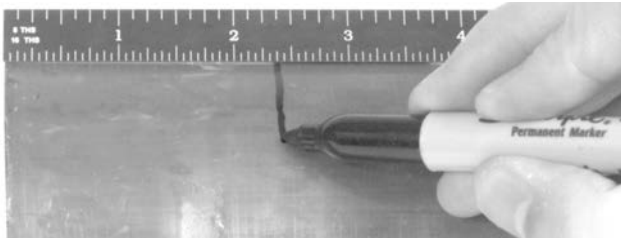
A – Inspection of the ProPress Fitting per the Manufacturer's Instructions
